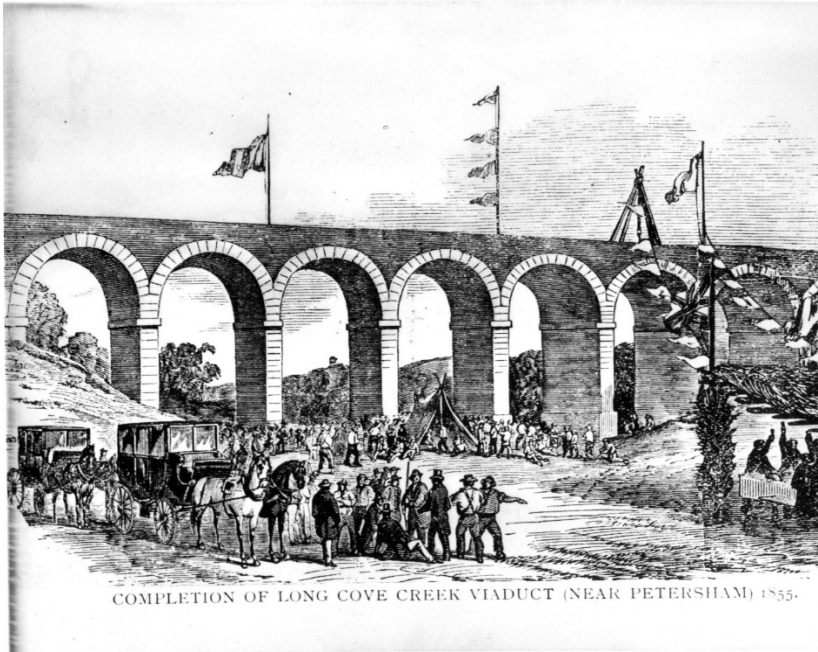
A contemporary drawing of the opening of the original stone and brick viaduct. RRC 8158
